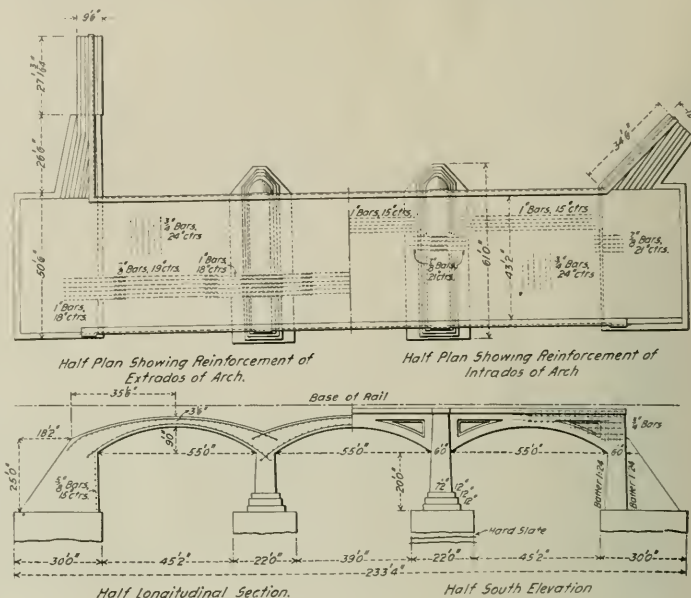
Plan and Elevation of Eagle Creek Bridge.
